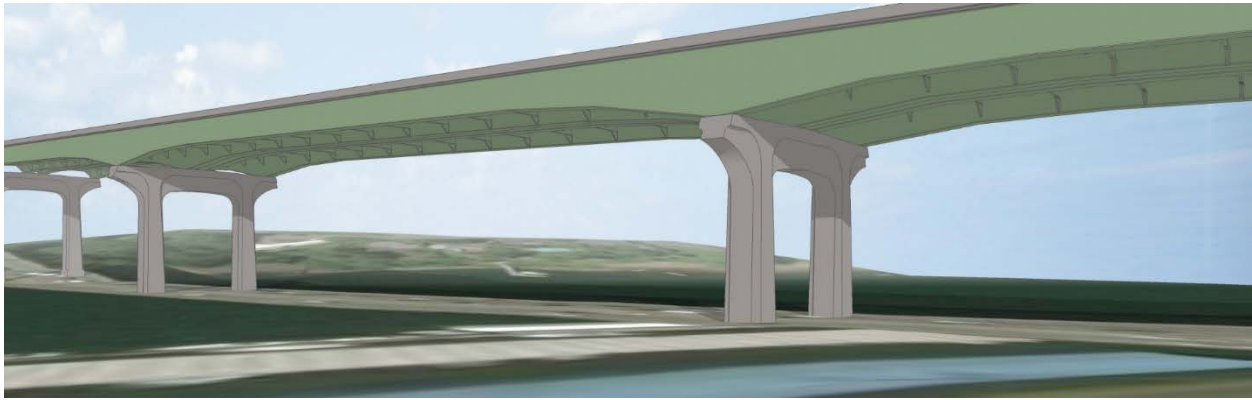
Rendering of the Future Widening and Pier Replacement of the Abernethy Bridge
